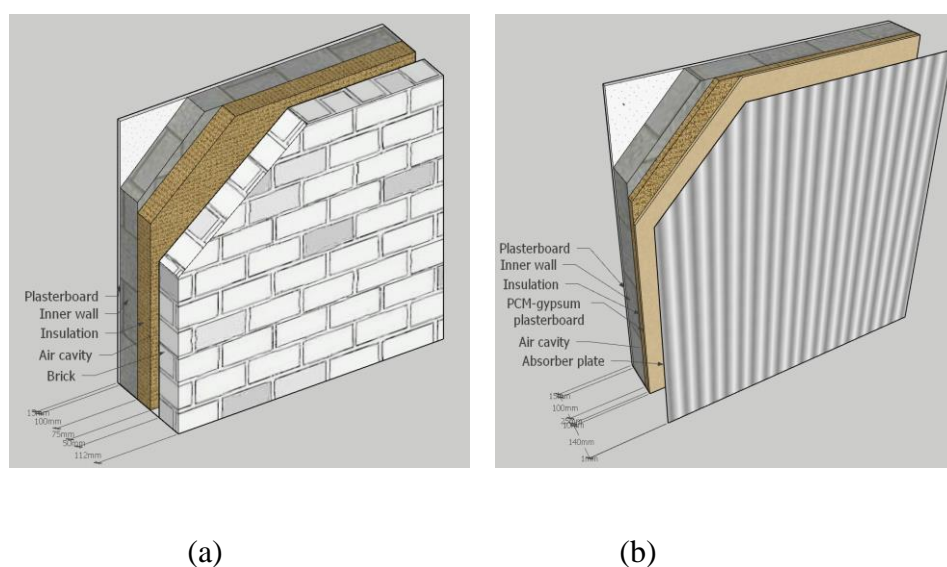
Schematics of (a) traditional wall and (b) proposed building envelope
